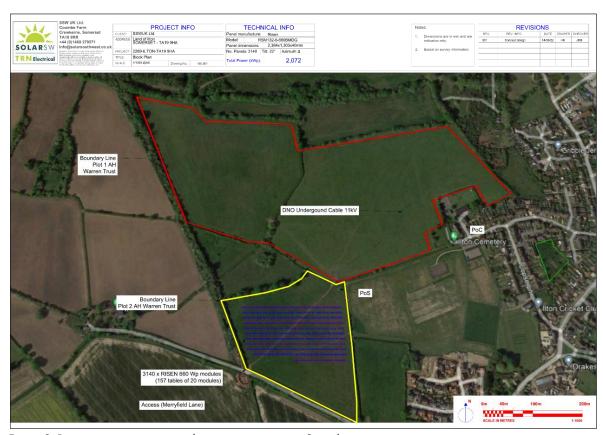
PROPOSED SITE LAYOUT PLAN (IMAGE SUPPLIED BY THE CLIENT).
